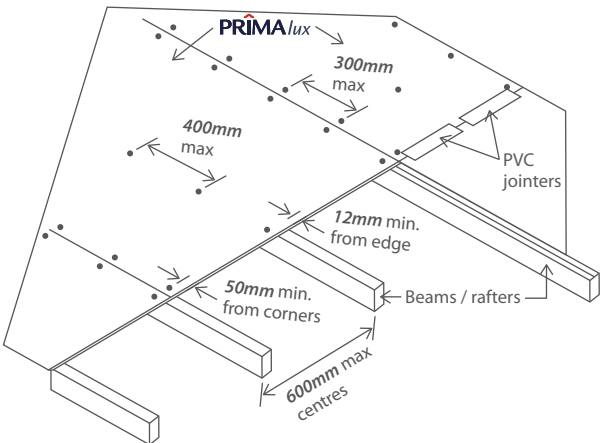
PRIMA<sup>lux</sup> Exposed Beam Ceiling
